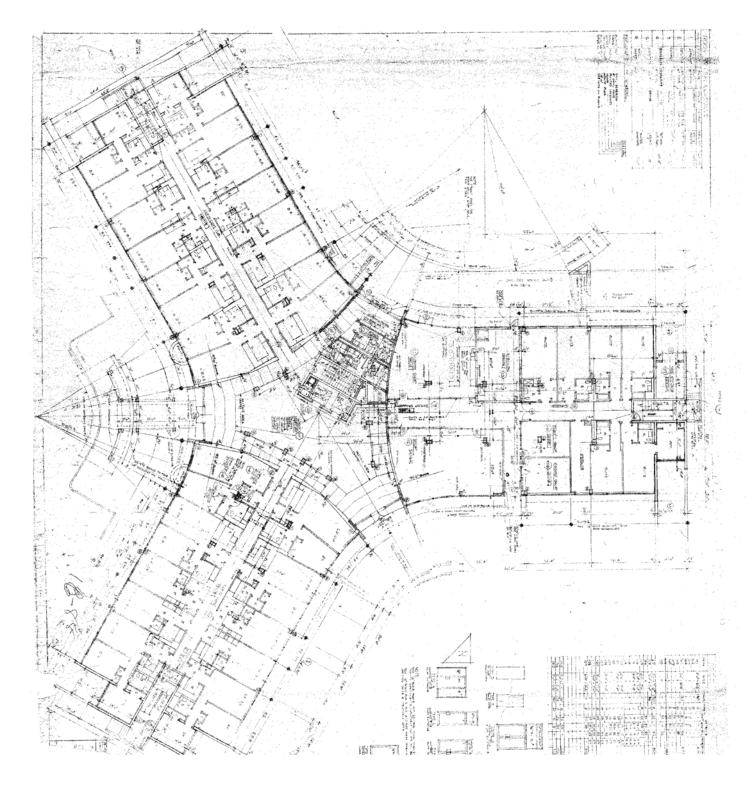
Floorplan, 2<sup>nd</sup>- 4<sup>th</sup> floors Collection of the Wedgwood
